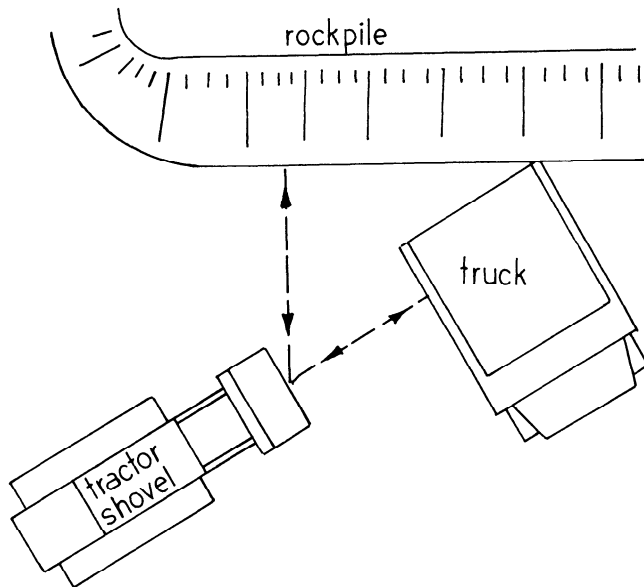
V-shaped path: crawler-mounted, front-end loader operation.
